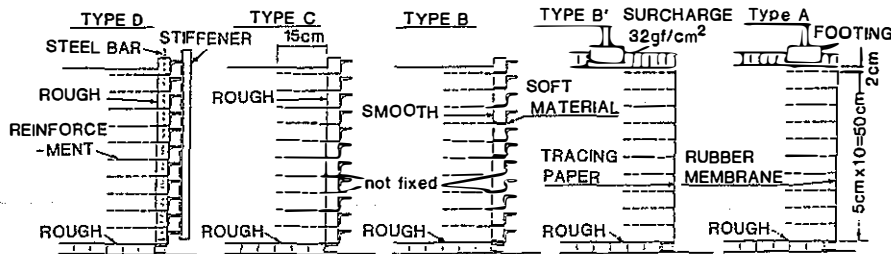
Small models of GRS retaining wall in the laboratory (Tatsuoka et al., 1989).
